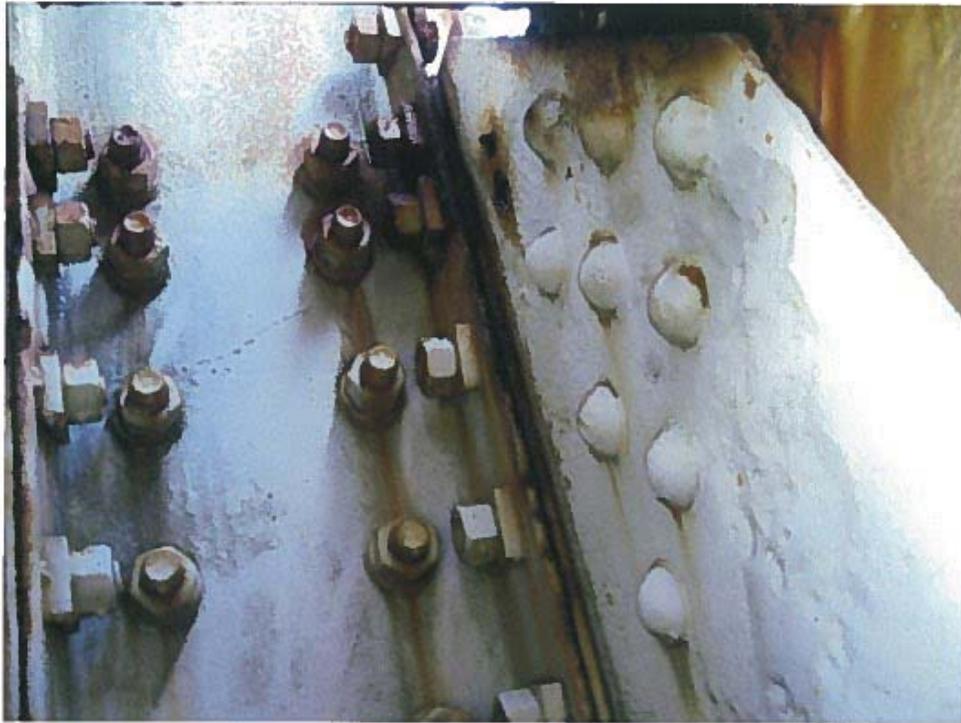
Condition of lacing bars along south truss bottom chord between panel points 3E and 5E.
